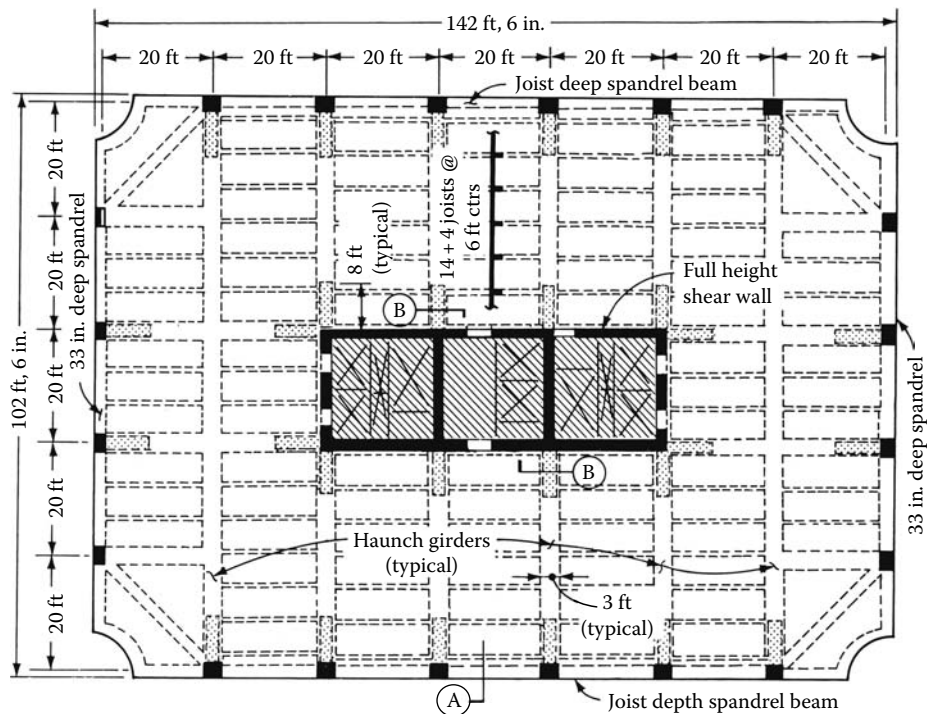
Typical floor framing plan: Haunch girder scheme.
